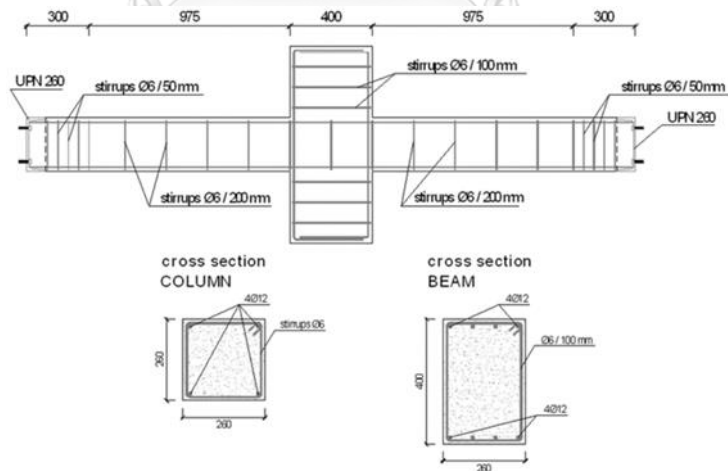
Specimen geometry and reinforcement (Adam et al., 2008)
